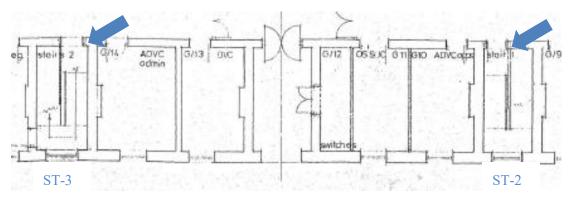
Direction of exit for Stair 2 & 3 in 1992 G/F plan [ArchSD modified by author]
